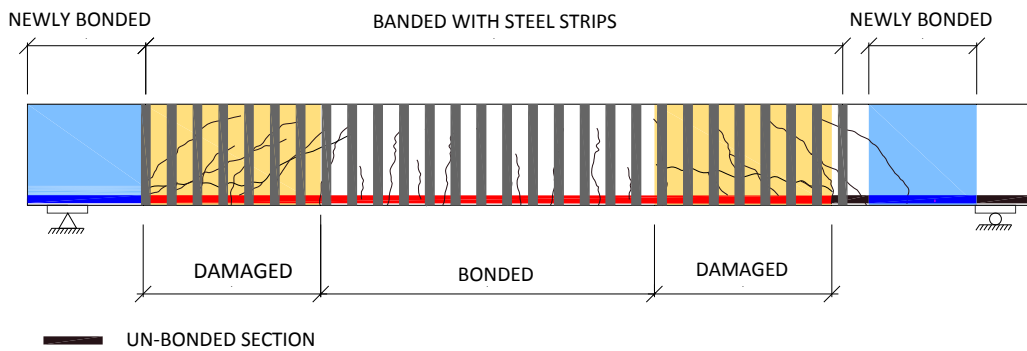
Restoring beams after debonding on both sides by steel straps in zone C and bond FRP in zone B
